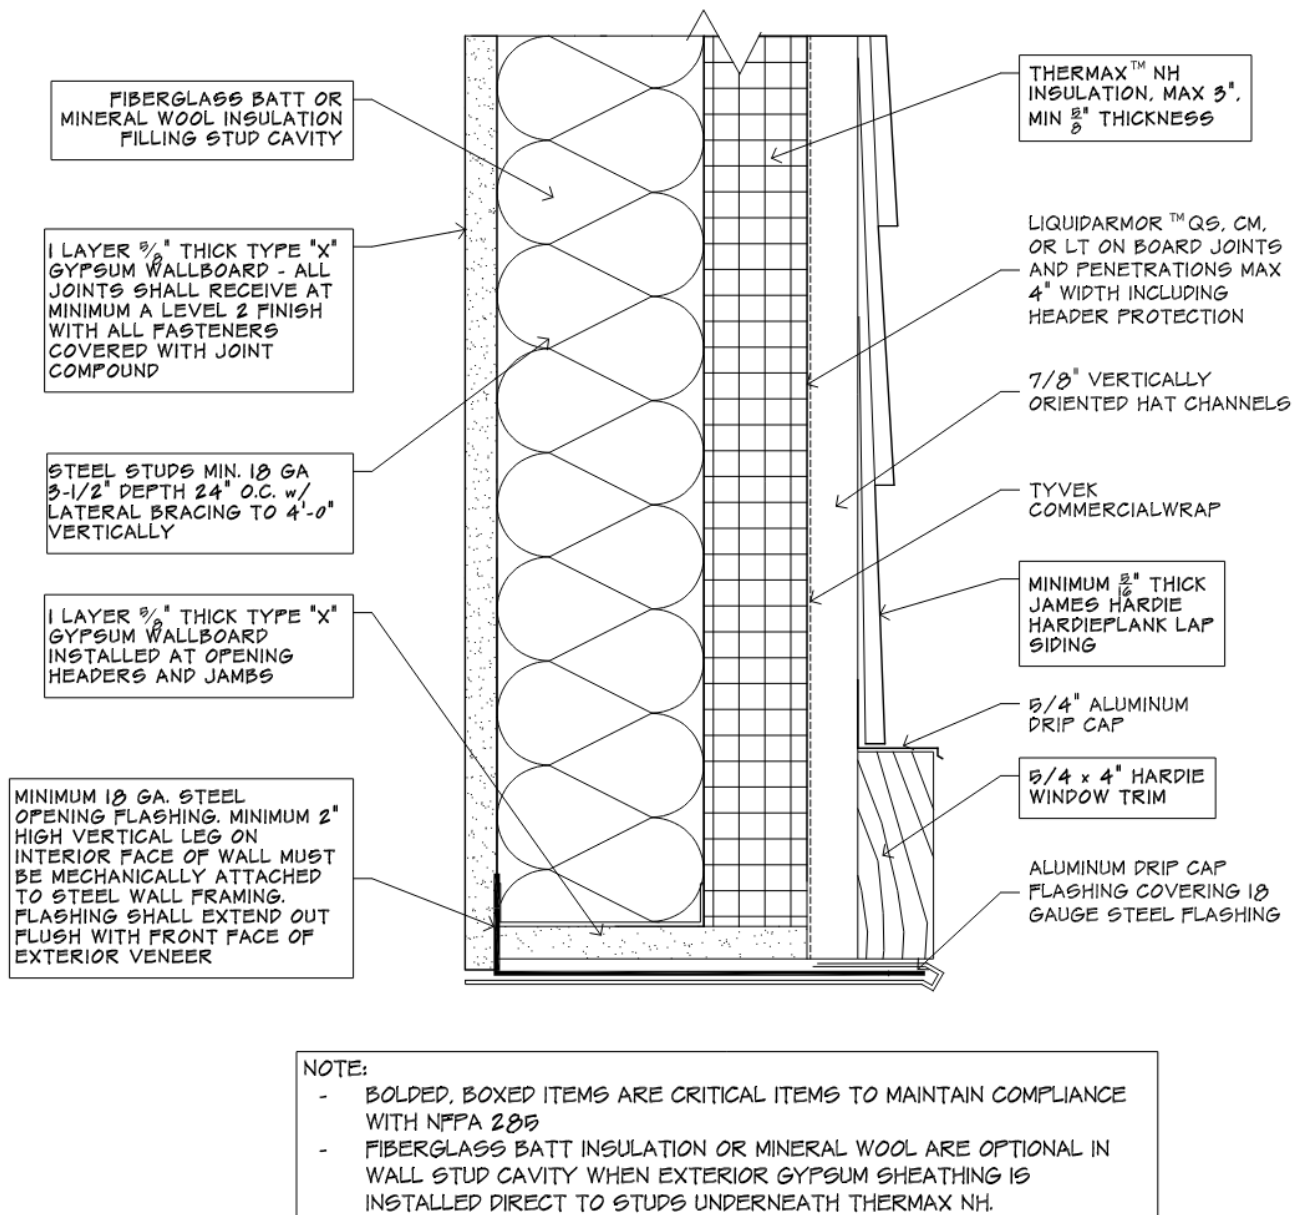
Exterior wall construction with James Hardie Hardie® Plank Lap Siding exterior veneer
